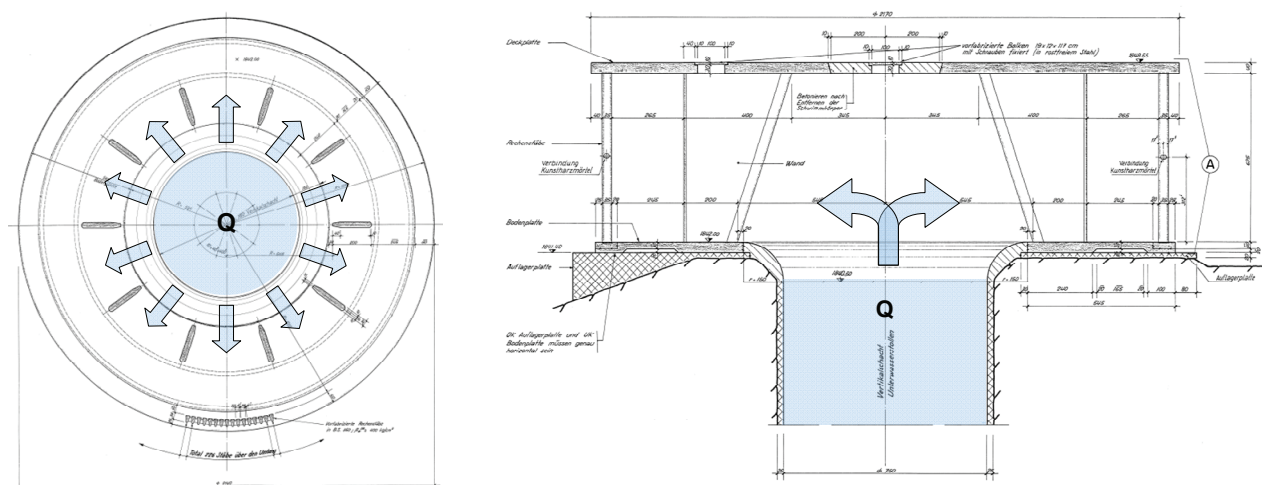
Schematic plan view (left) and cross section (right) of the intake/outlet structure of the Grimsel II plant
